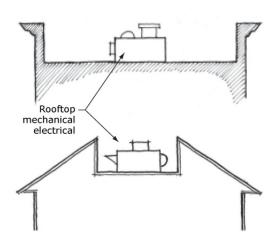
Rooftop and ground-level equipment must be screened from view along public rights-of-way. Here, mechanical systems are hidden by cornice and roof elements.
